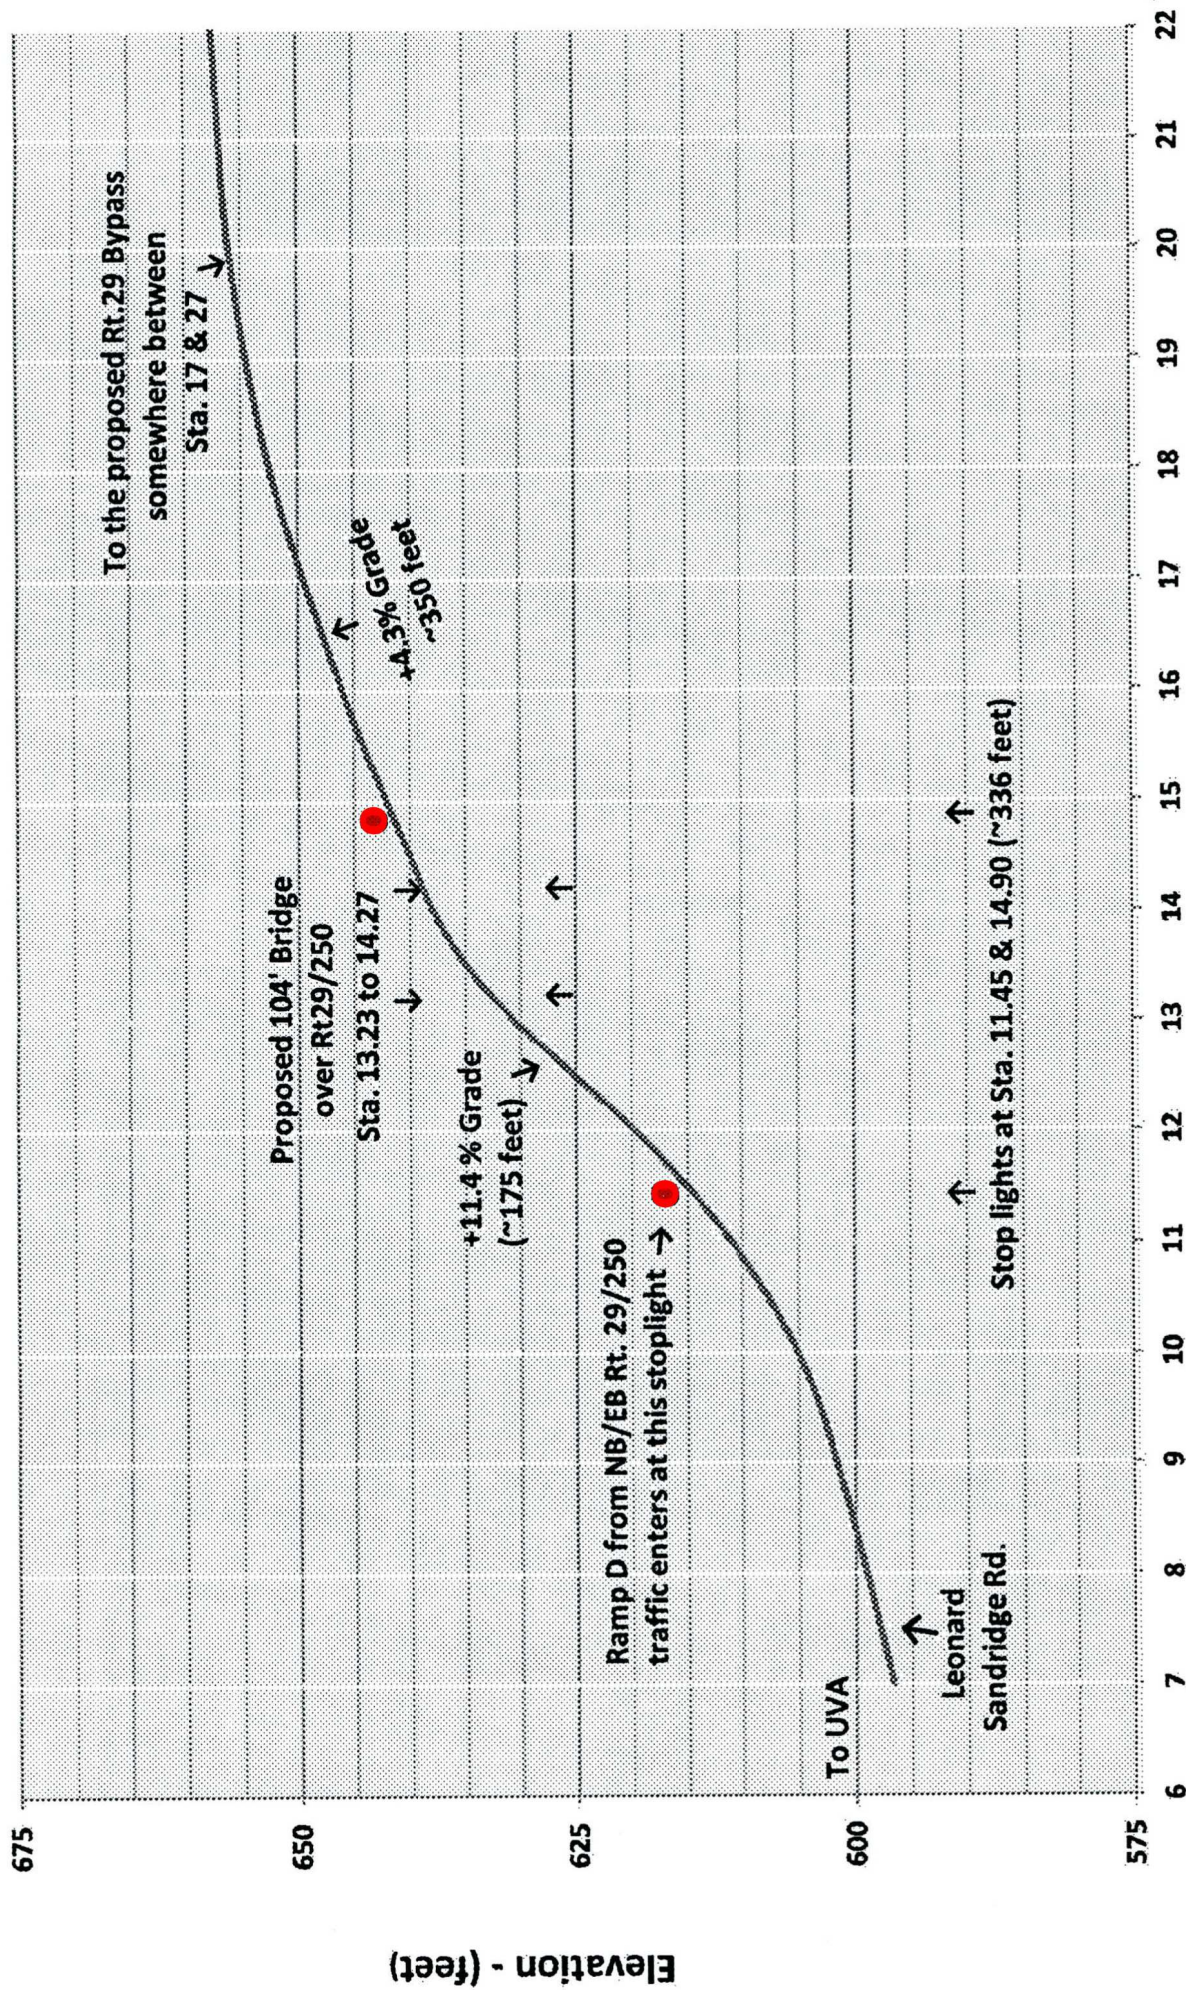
Leonard Sandridge Road ends & proposed Rt. 29 Bypass begins somewhere on left half of this segment?? - 2012 Plans
